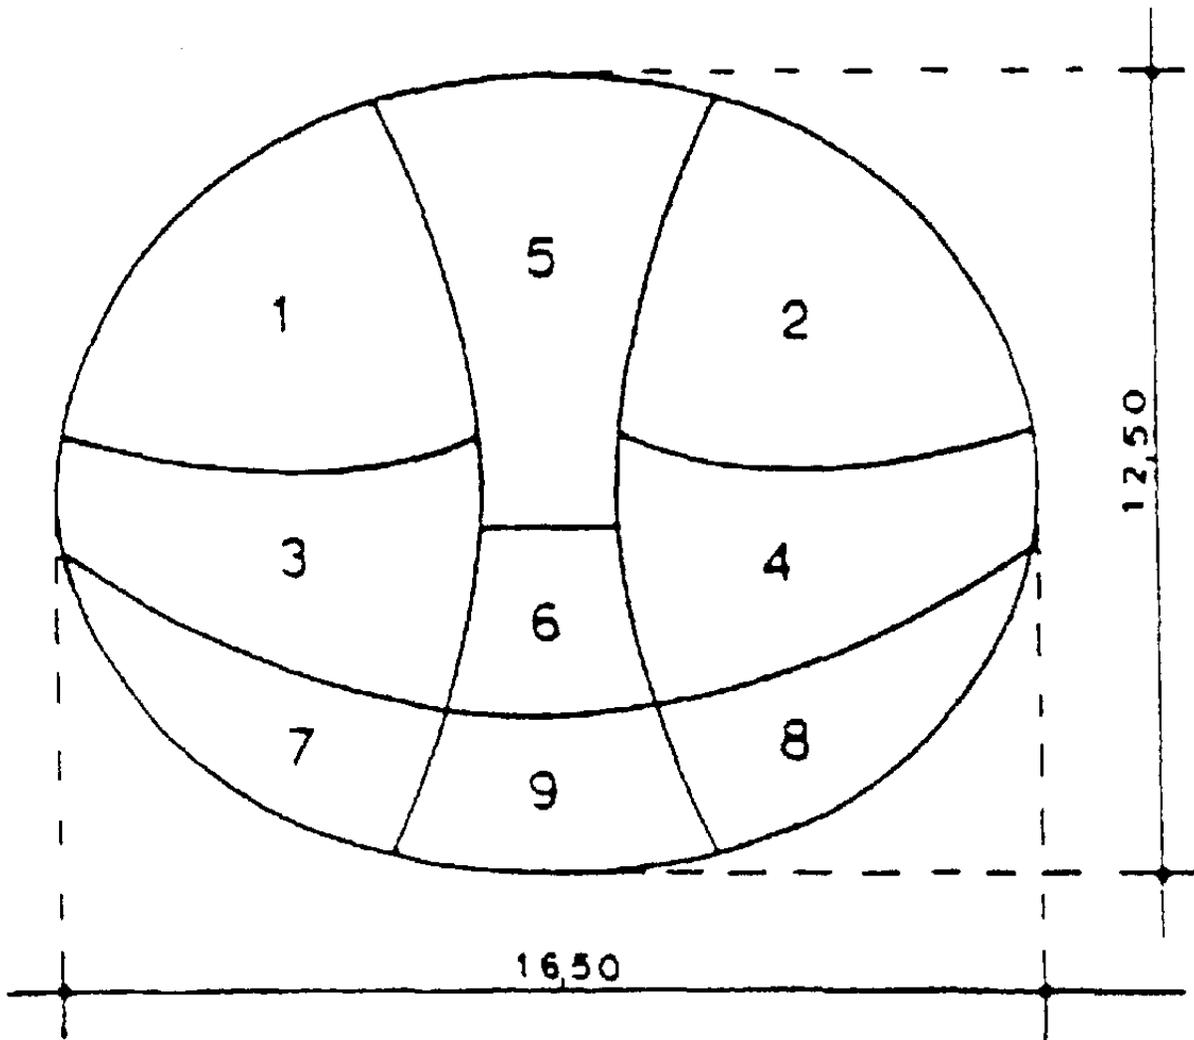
Station Geometry and Excavation Stages (Kavvadas)
